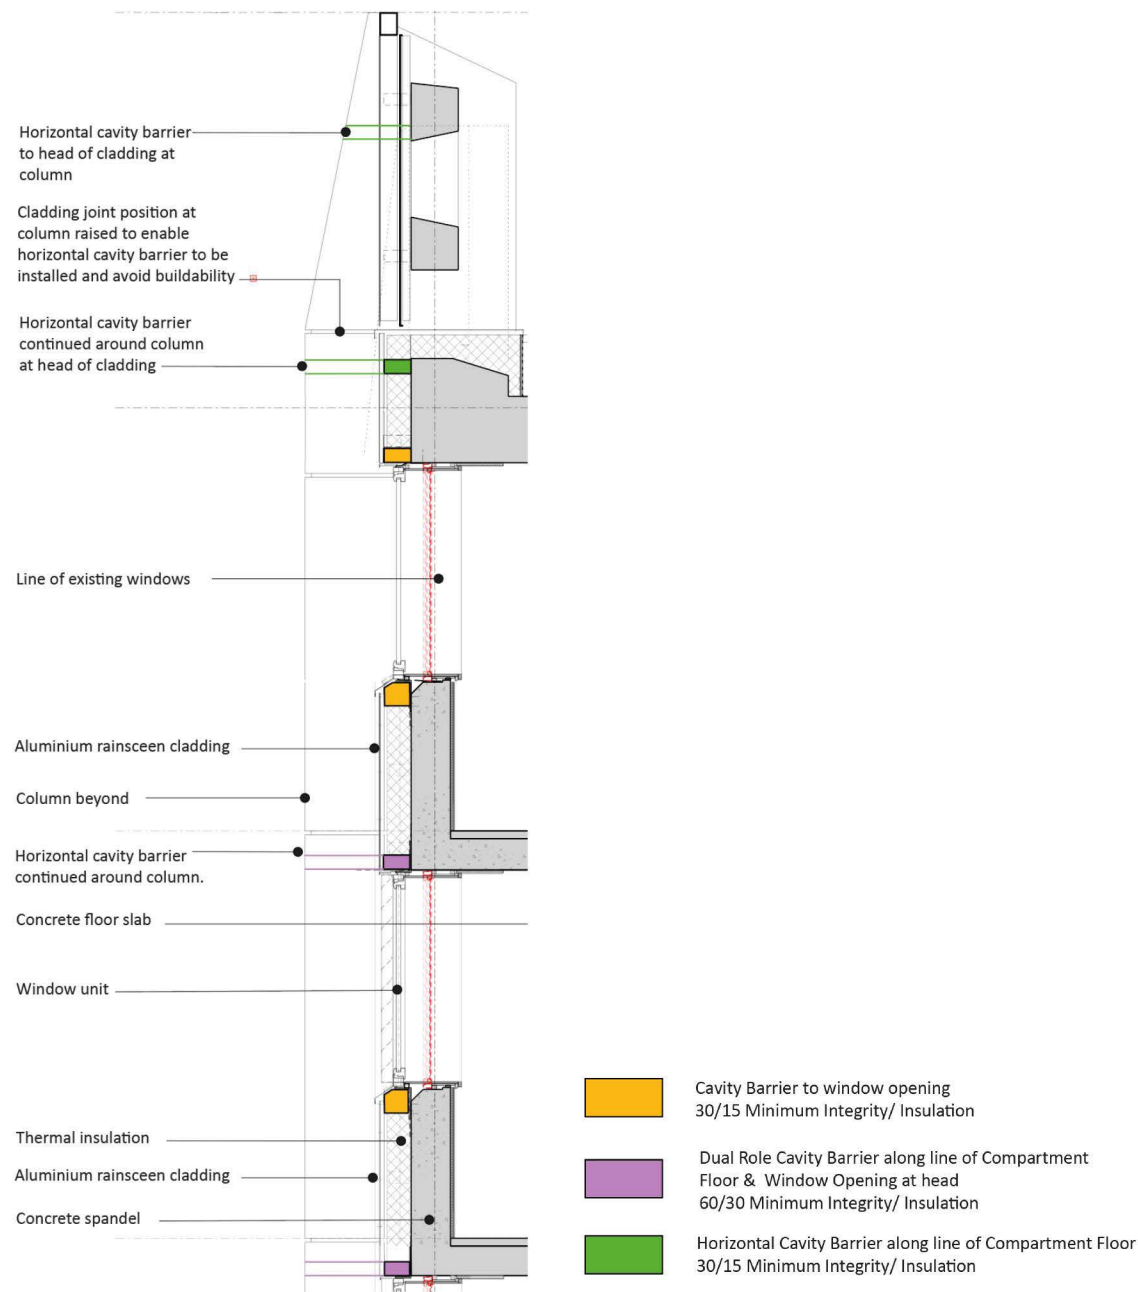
Typical elevation bay 'C' with cavity barrier arrangement
